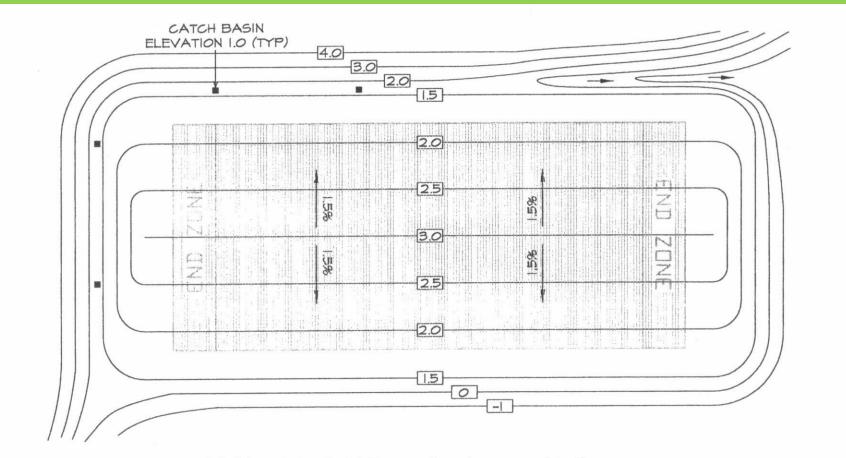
Crowned field with level sidelines-elevations noted in feet.
